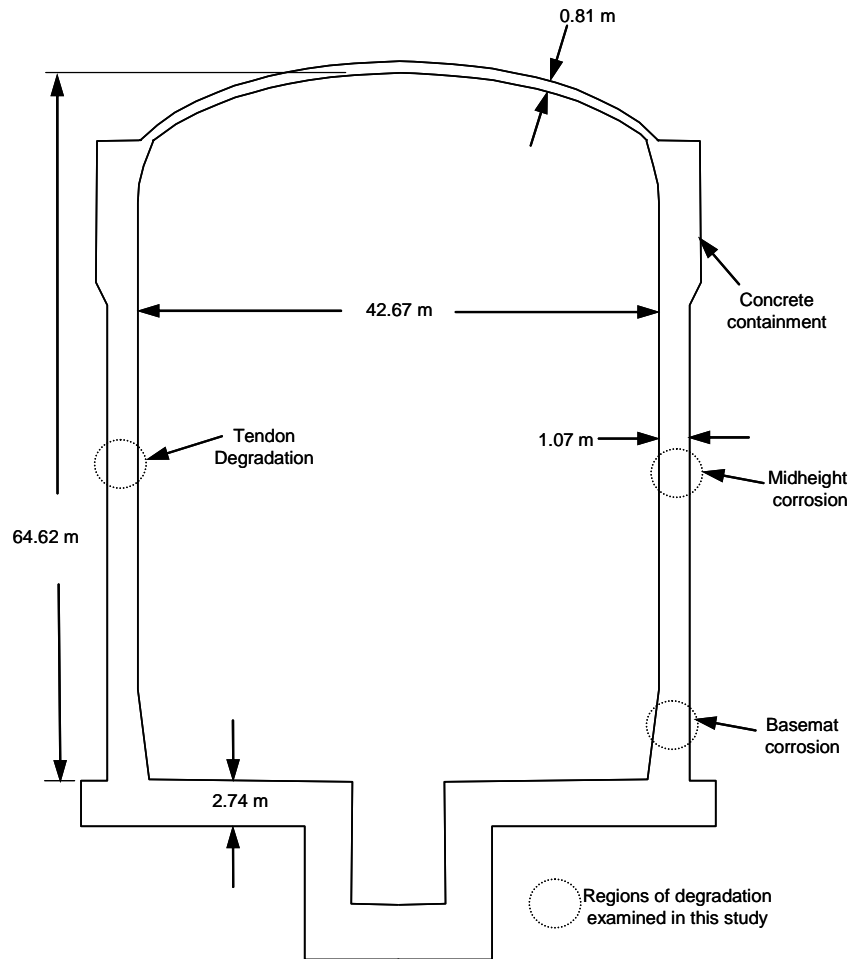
Postulated Degradation in Prestressed Concrete Containment
